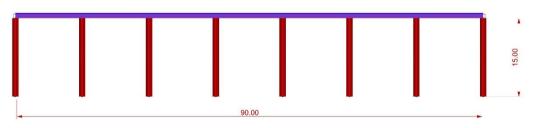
Side view of the pier structure above sea bed. Units in meters.
